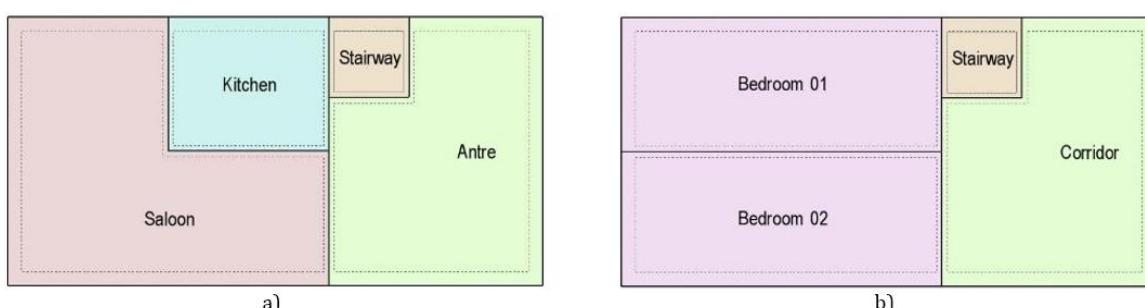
Model view of a) ground and b) first floor plan of the sample building.
